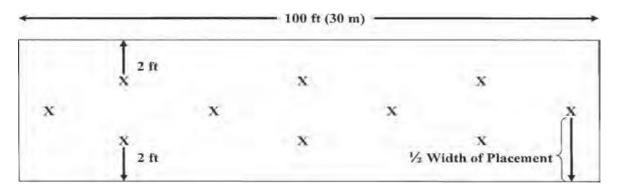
INDOT test section for LWD (for reference as DCP test section)
